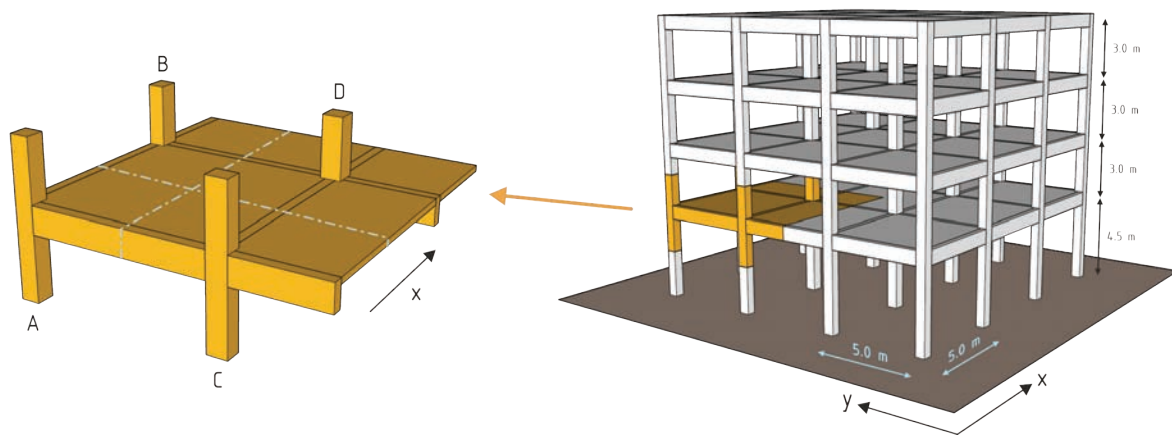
Extracting beam-column joint configurations from an R/C frame building.
